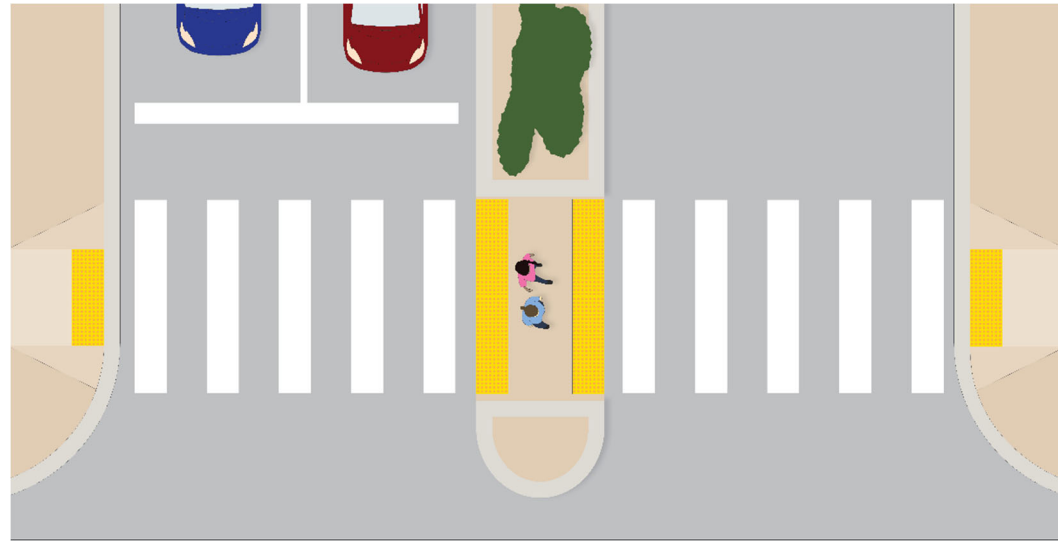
PEDESTRIAN ISLAND PLAN VIEW
